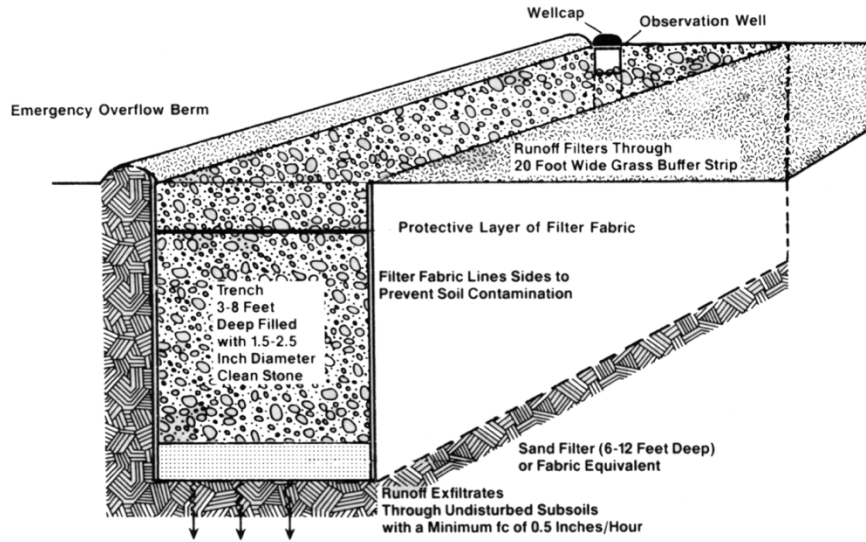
Typical infiltration trench design (Source: Schueler, 1987).
